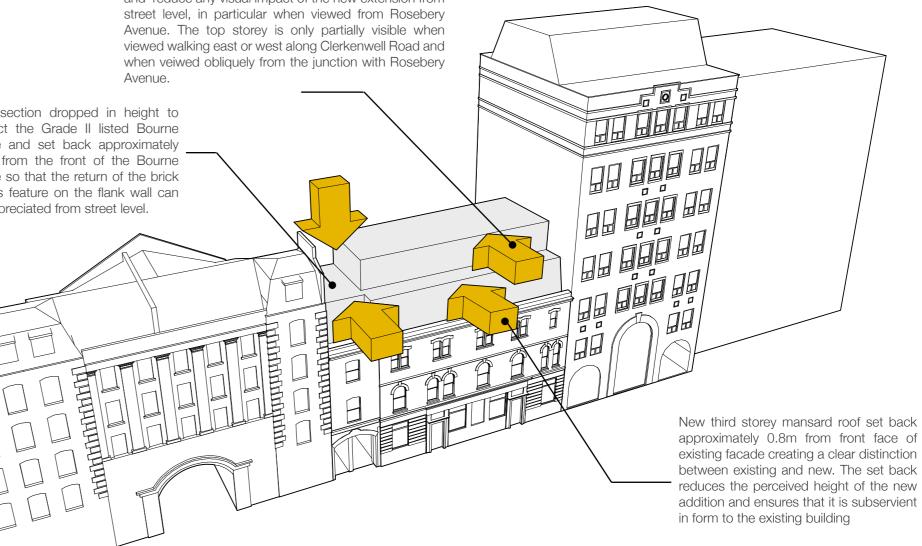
Image A: Proposed view from Grays Inn Road looking East down Clerkenwell Road
